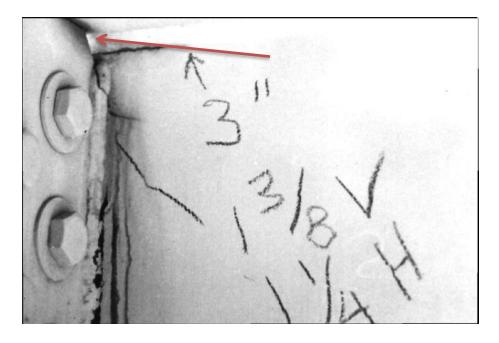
Fatigue Cracks at Floor Beam Connection Plate Web Gap
